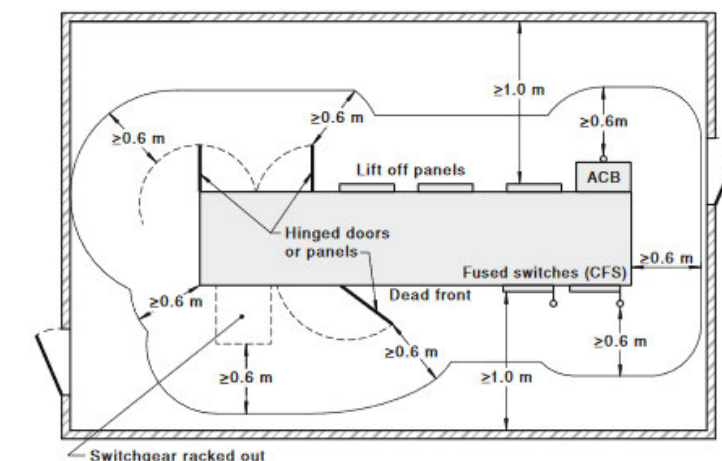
ACCESS TO SWITCHBOARDS—
